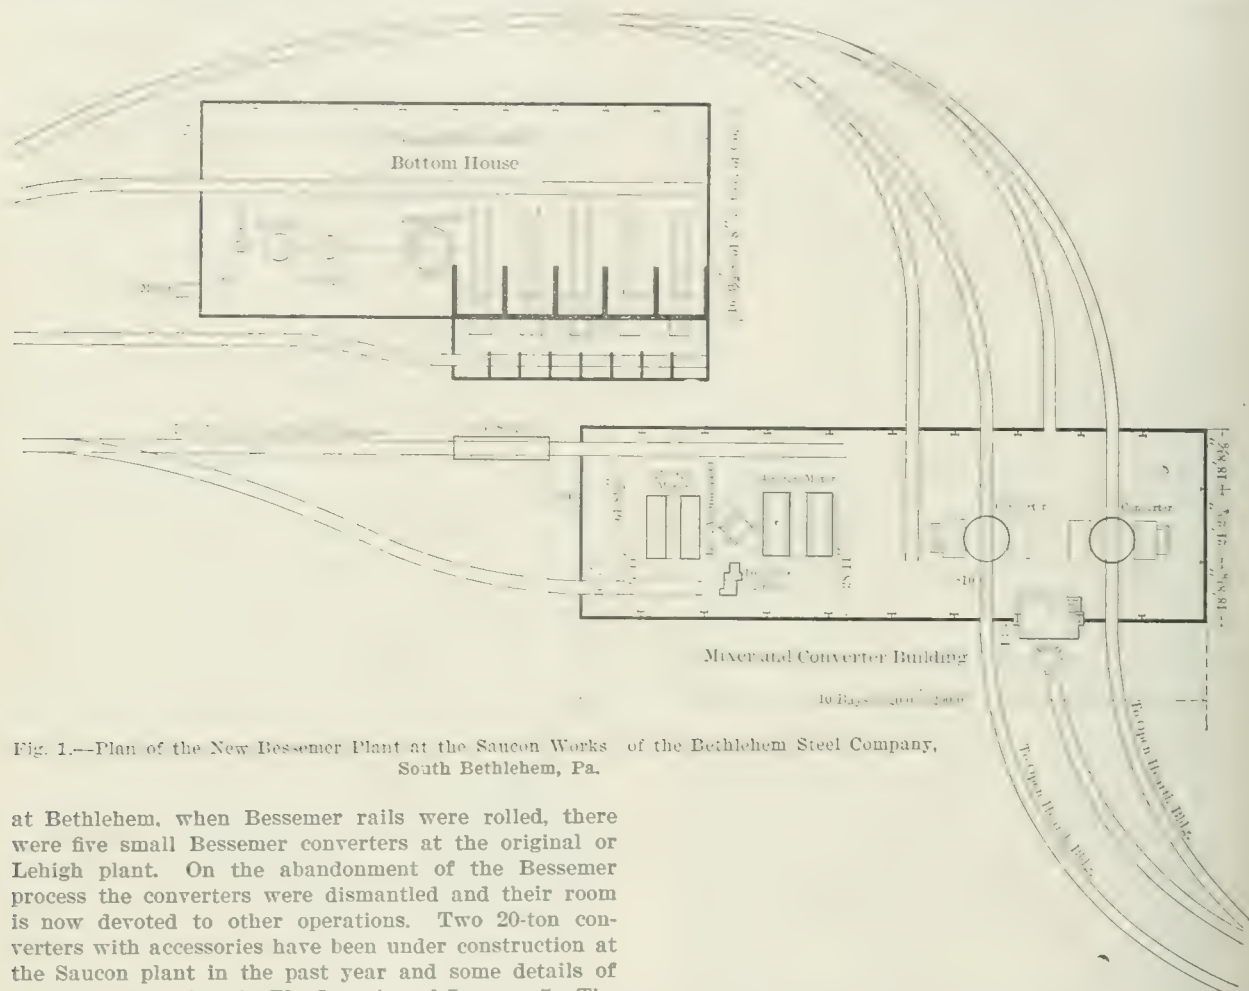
Plan of the New Bessemer Plant at the Saucon Works of the Bethlehem Steel Company, South Bethlehem, Pa.
